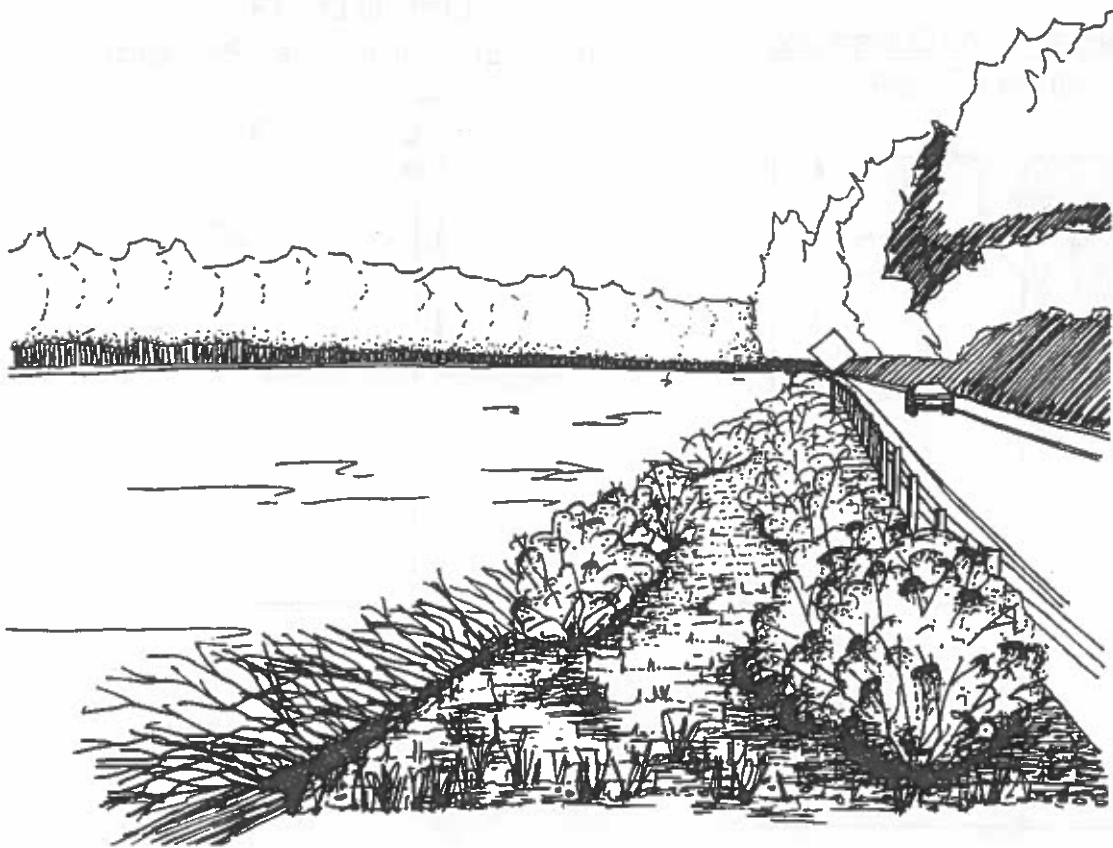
Proposed use of bioengineering to stabilize the slope and allow for use of 3-cable guiderail
